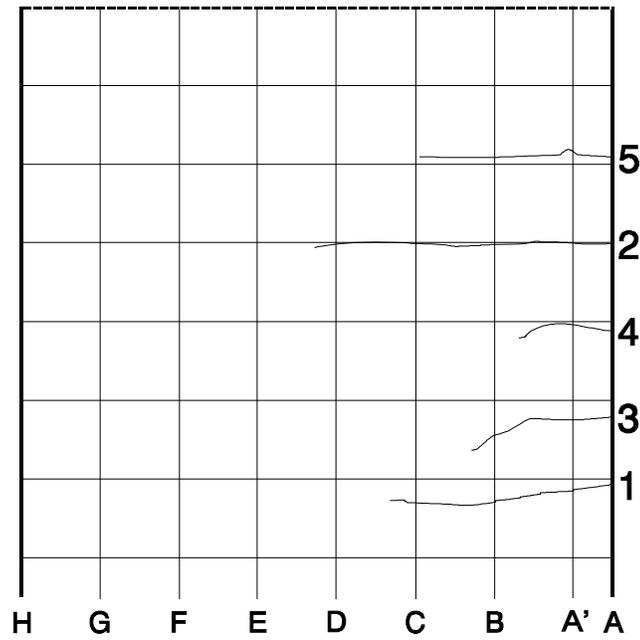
POJ-PU-54-TH cracking pattern on south face of pier at dead load
